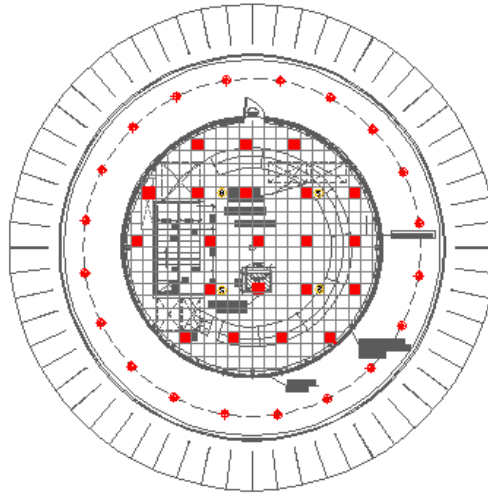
Typical Plan Layout of Air Traffic Control Room
